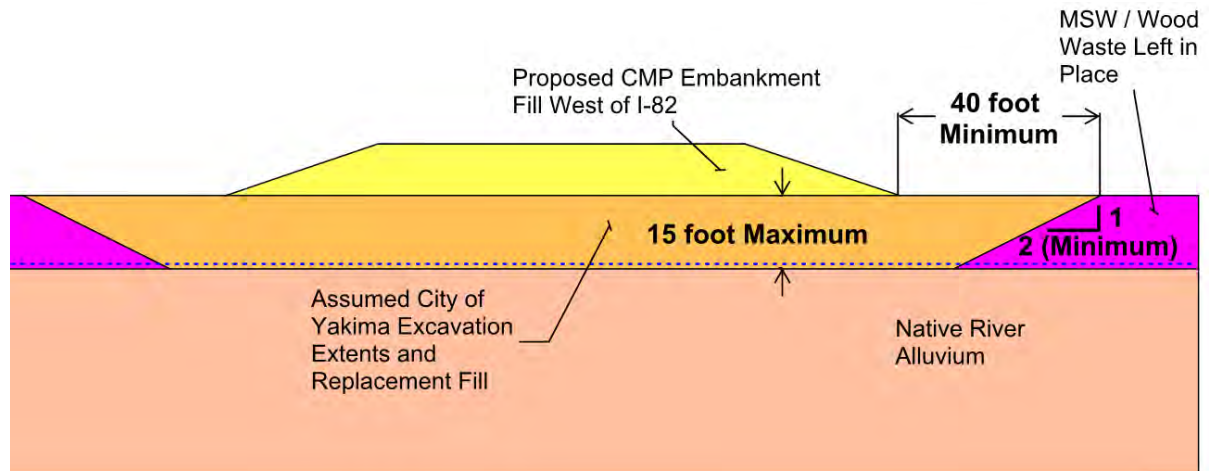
Assumed MSW and Wood Waste Geometric Parameters for CMP Embankment West of I-82
